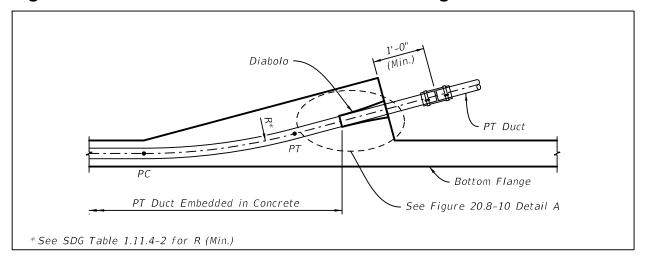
Detail at Pier Segment with Tendon Saddle
